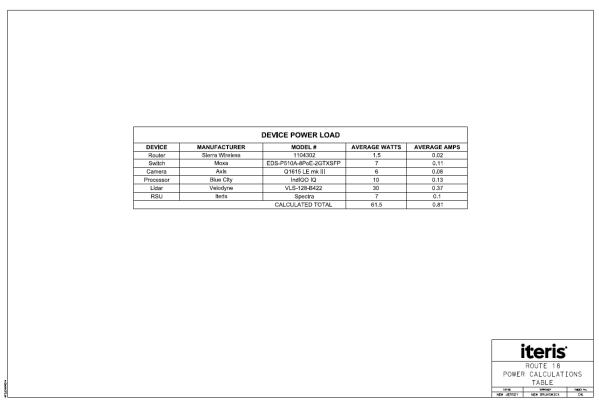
Device Power Load at Route 18 - VMS Sign Bridge
